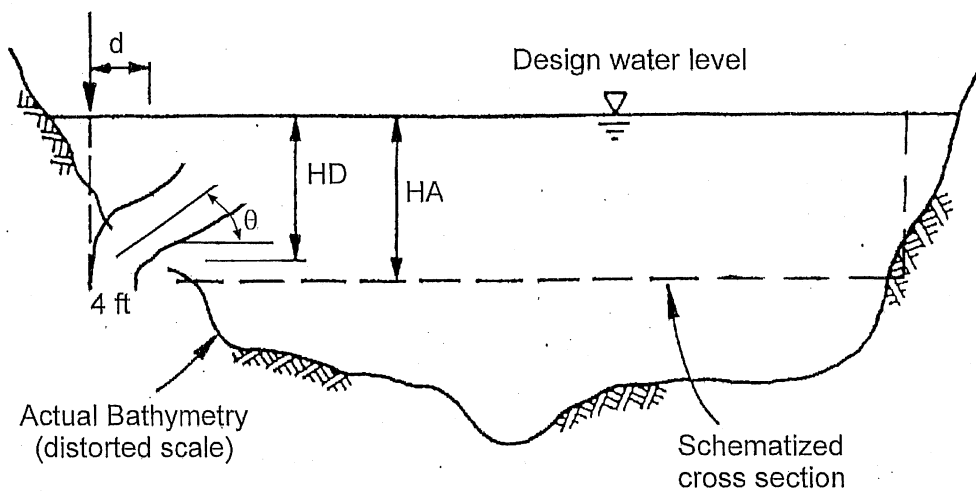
The geometry of Cross Section 17 (looking down steam) and schematized rectangular cross section.
